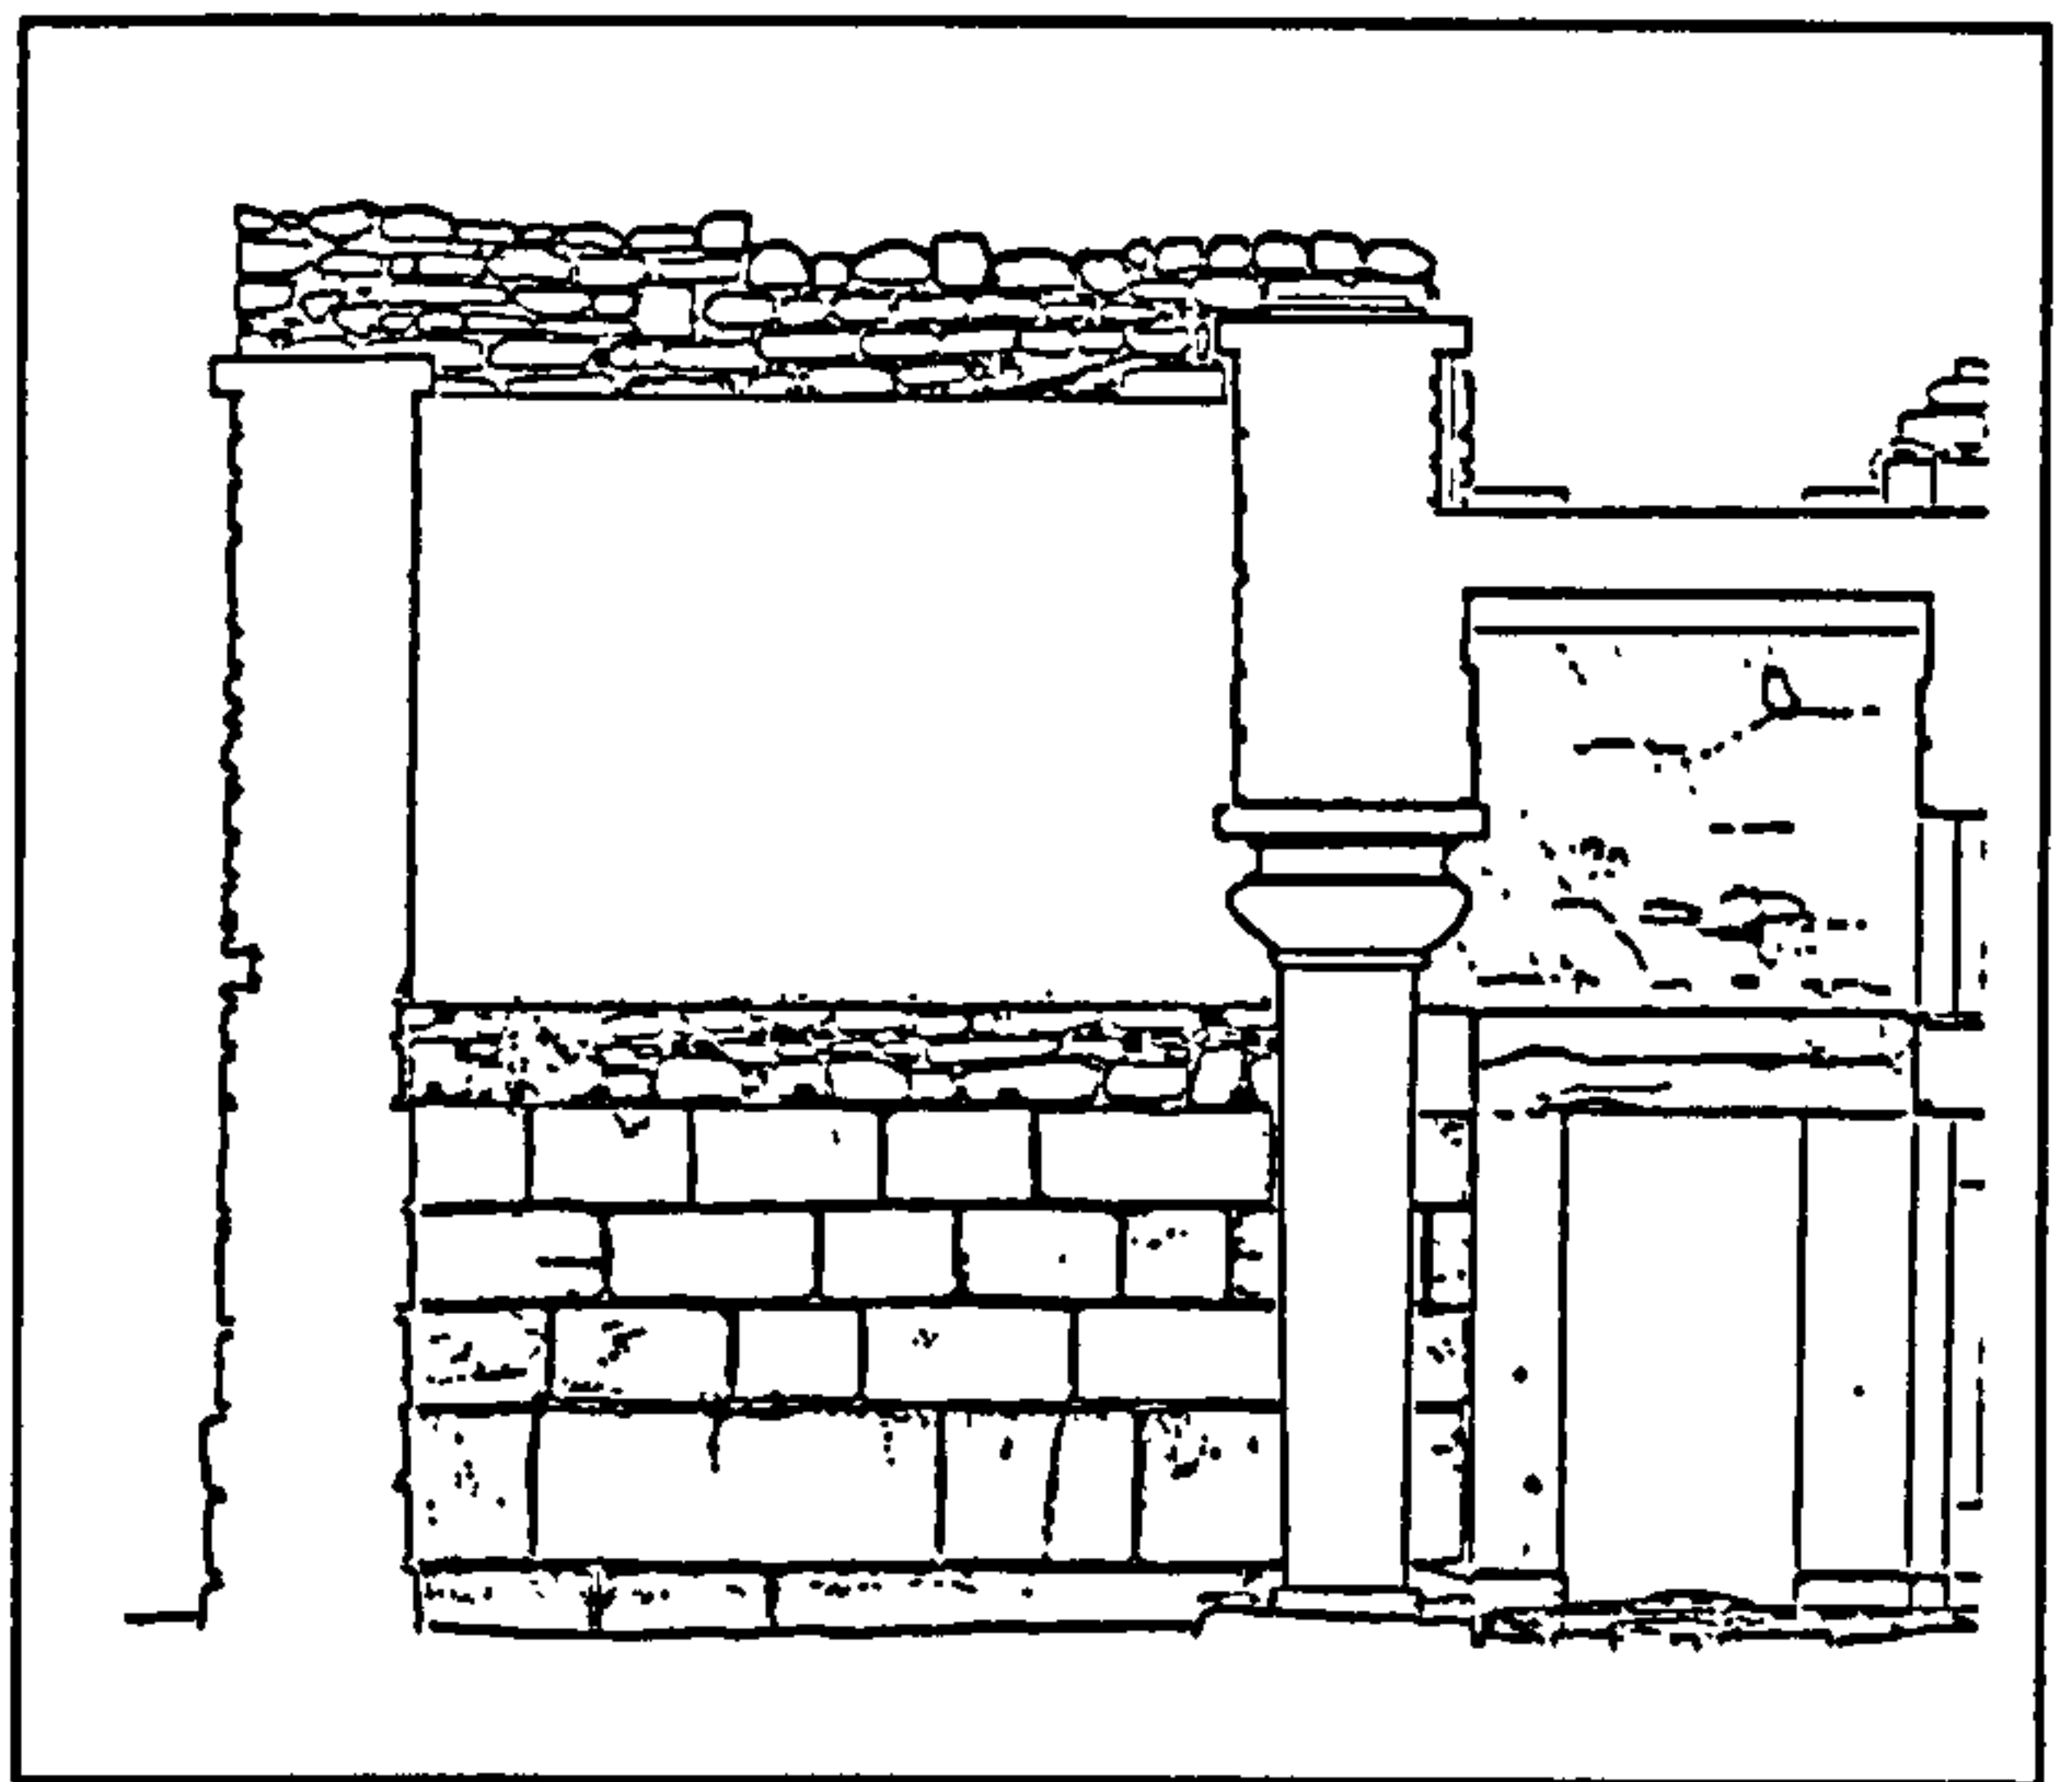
Light well, Queen's Megaron, south wall with ashlar masonry (lower four courses) and plastered rubble masonry above.
